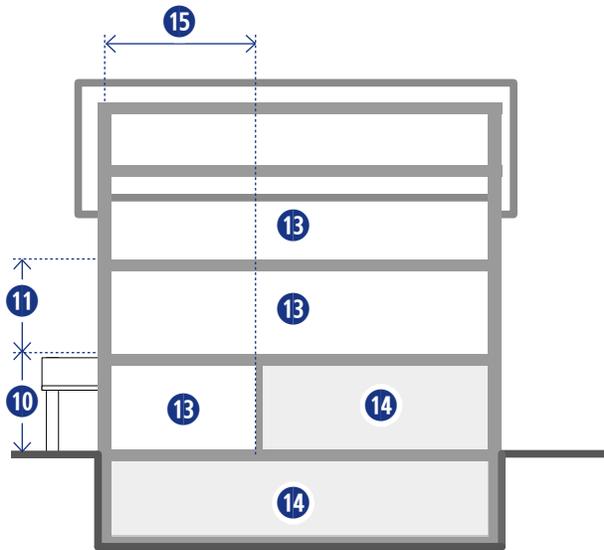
Yardhouse Building: Floor-to-Floor Height & Use Requirements
